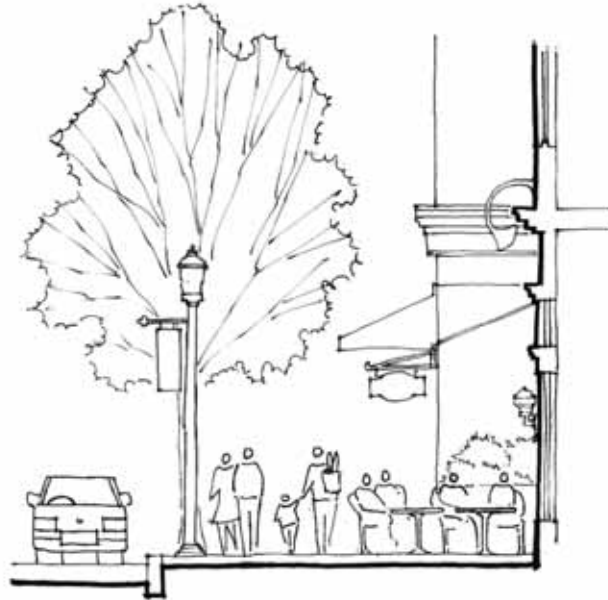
Adding street trees, awnings, textured pavement, and other site furnishings can help reduce the scale of a roadway and slow traffic.
